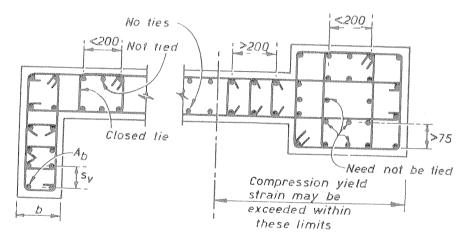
Transverse Reinforcement in Potential Yield Zones of Shear Wall Sections.
